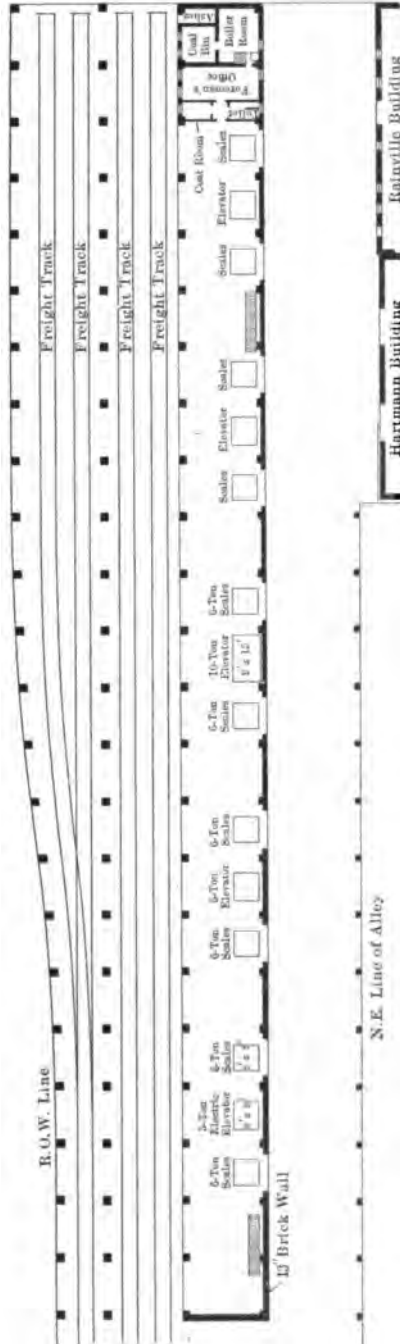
First floor plan, freight-house, Minneapolis—Wisconsin Central.
